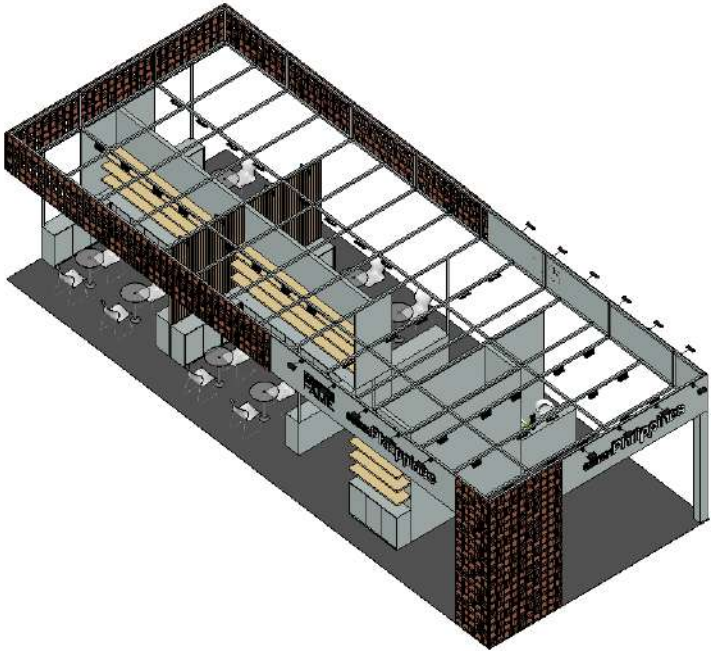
EXHIBITION AND DESIGN DIVISION		PROJECT: TOKYO INTERNATIONAL GIFT SHOW 2025	CONTENT: DETAILS
